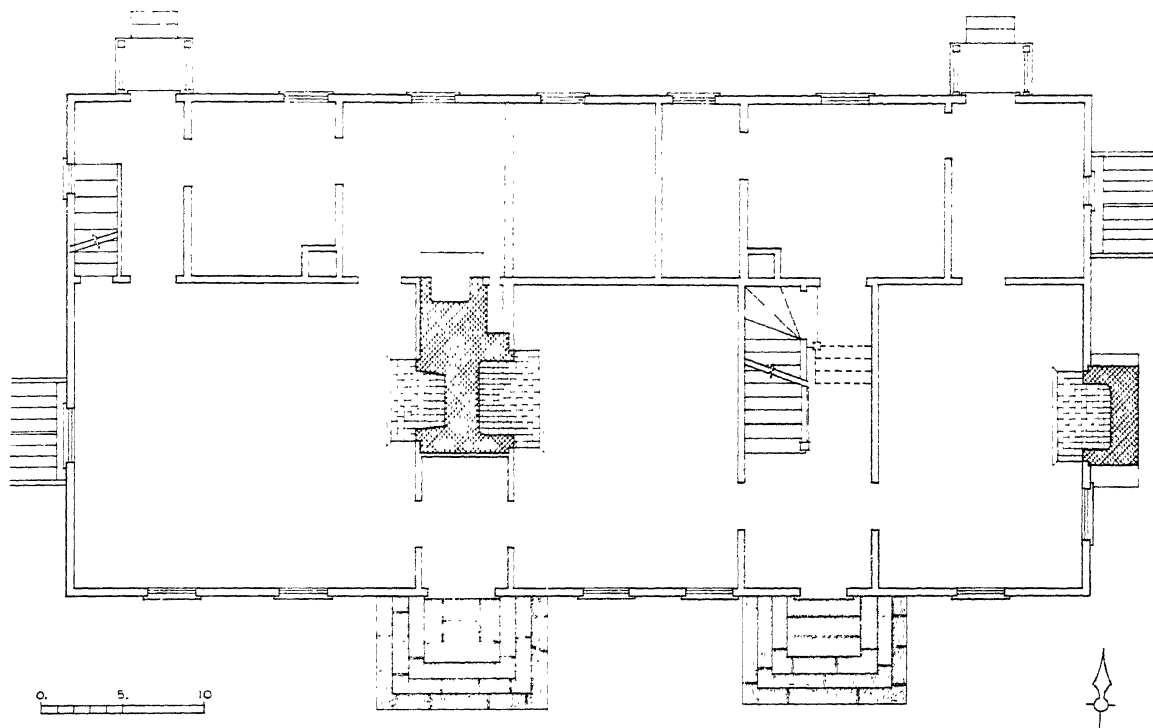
THE JOHN BLAIR HOUSE. Plan.
